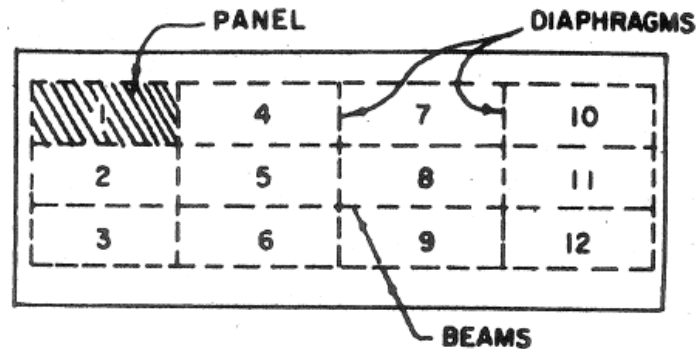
Model Bridge Deck Subdivided Into Panels
